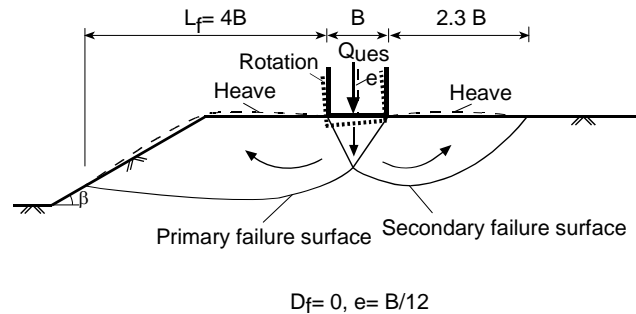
Failure surfaces for eccentrically loaded model surface strip footing resting close to slope (Test 2a sur.)
